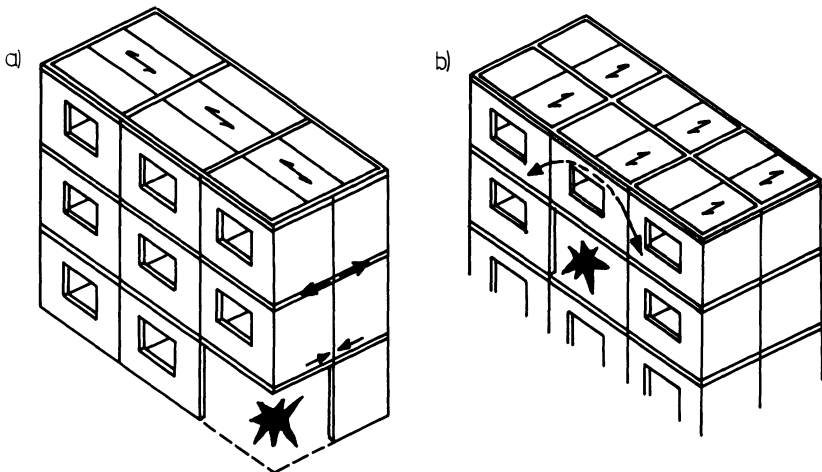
Secondary stability system developed in partially damaged large panel building; a. cantilever system; b. beam system
